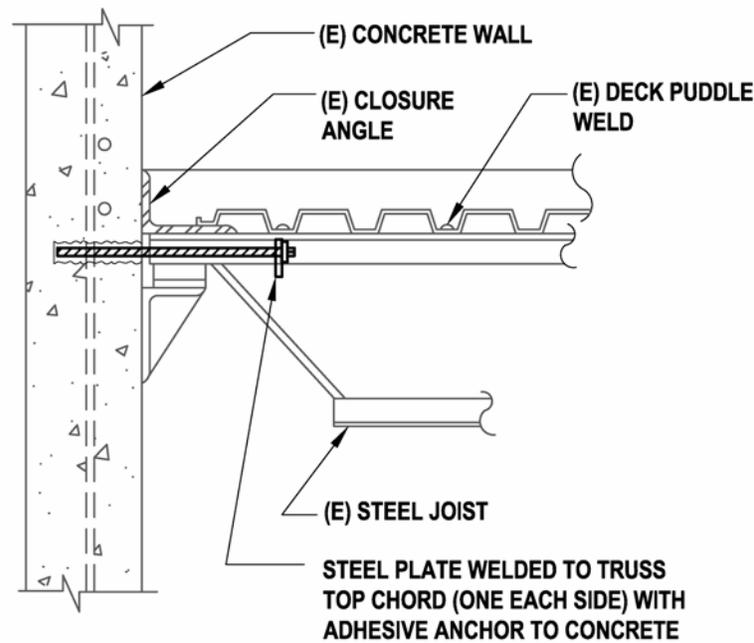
B: Wall Out-of-Plane Anchorage for Flexible Steel Diaphragm – to Decking for Load Parallel to Flutes
